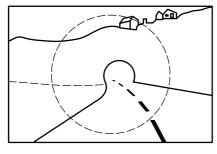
Examples of tunnel approaches giving access zone luminances to be used (1 of 2)
